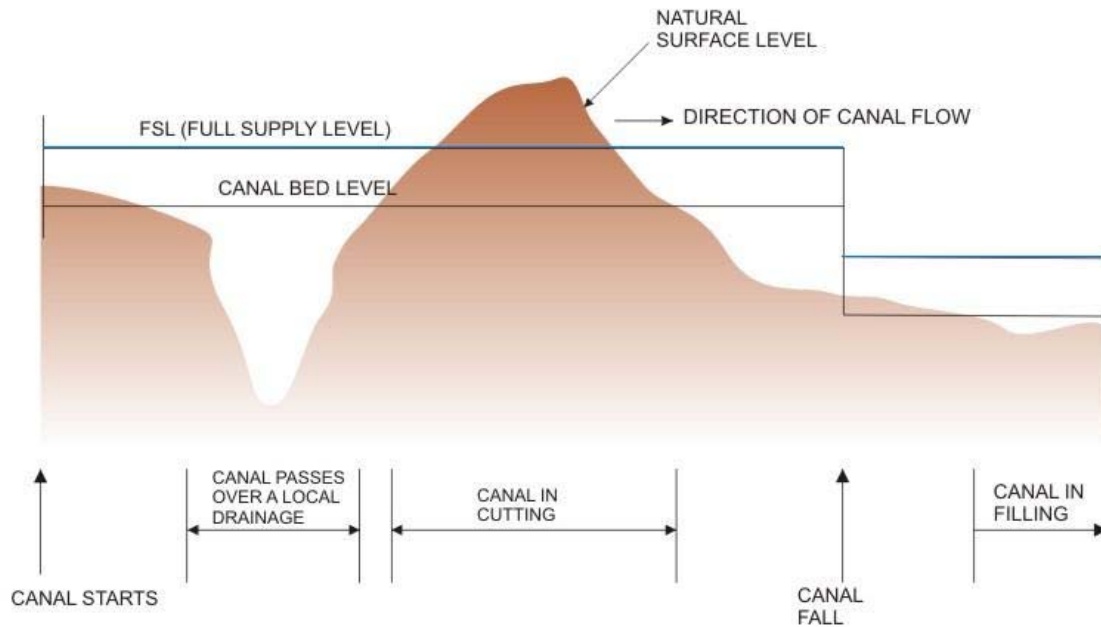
Longitudinal section of a canal assuming no withdrawals in this stretch
